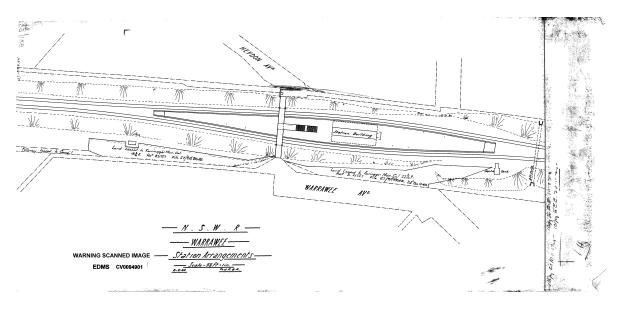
1925 plan of Warrawee Station showing location of the original timber footbridge, septic tank, culvert, unidentified structure at the top of the cutting and station building arrangement. Source. Sydney Trains Plans Room.
